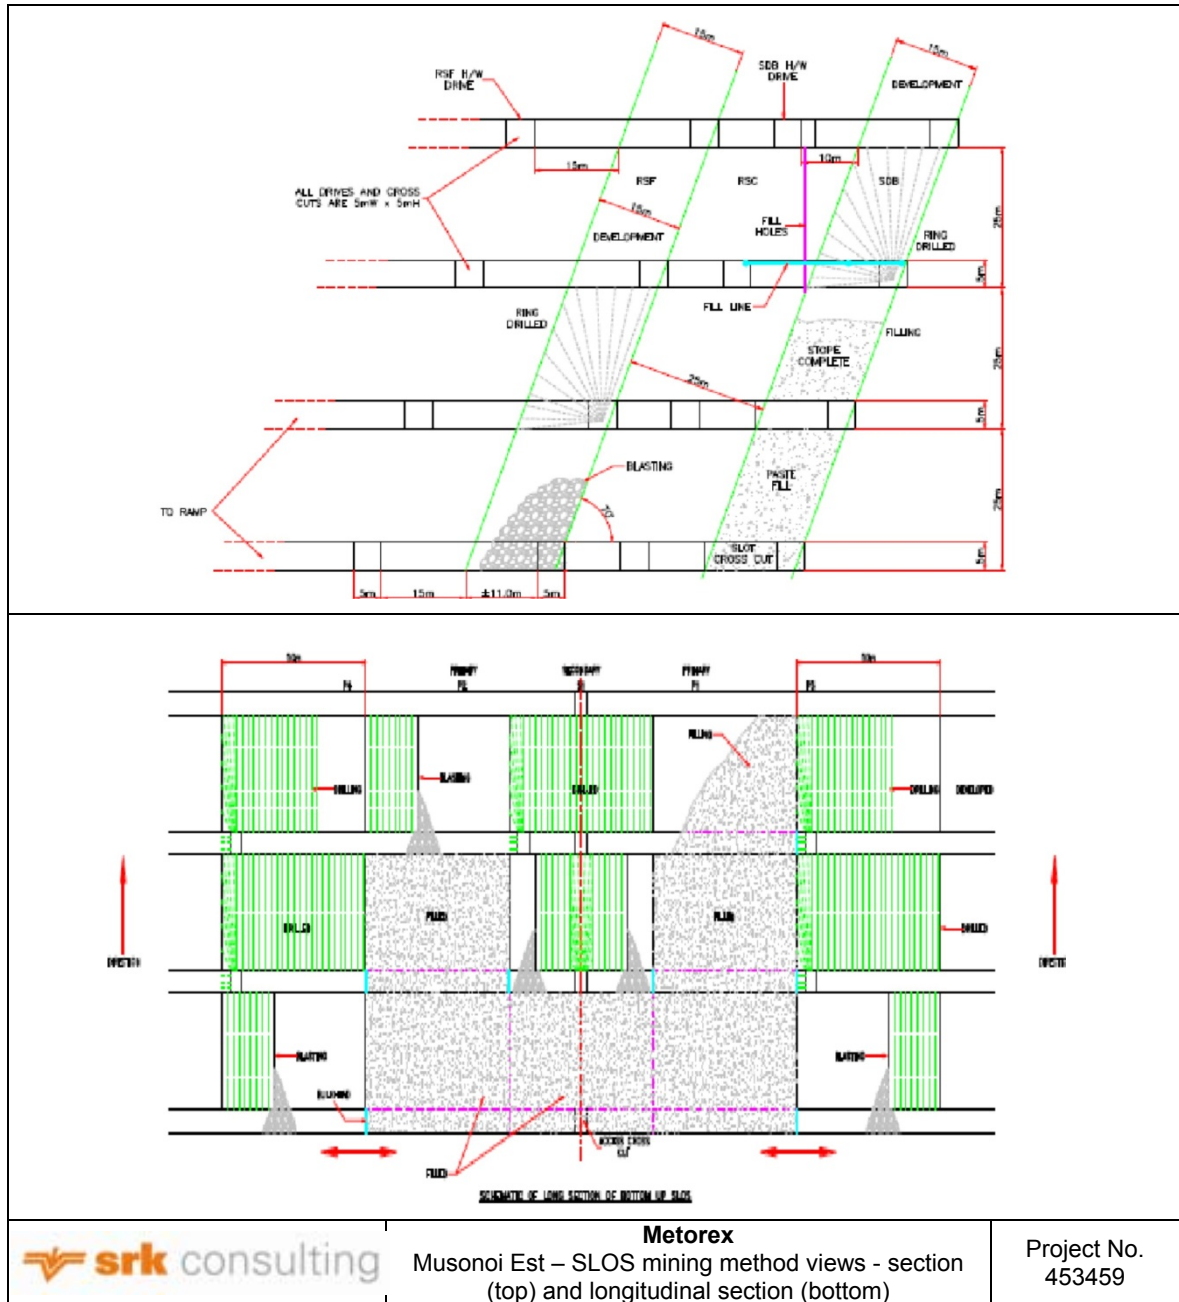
Musonoi Est – SLOS mining method views - section (top) and longitudinal section (bottom)
